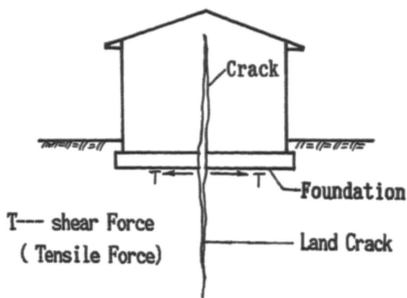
Ground Crack Occurs Below Foundation Vertically
